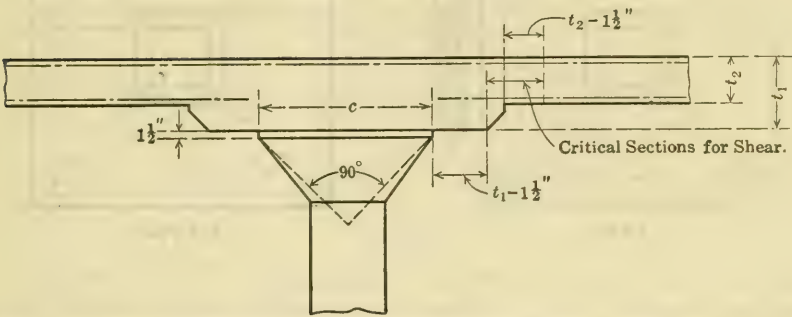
TYPICAL COLUMN CAPITAL AND SECTIONS OF FLAT SLAB WITH DROPPED PANEL.
